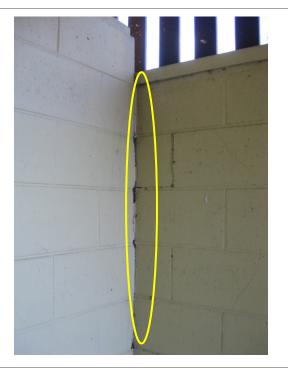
Cracking along the Mortar Joint in the NE Corner of the Joint
